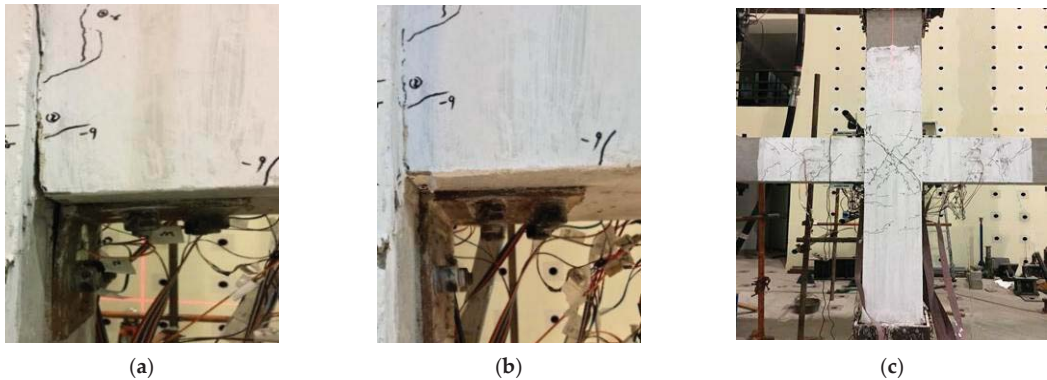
Crack pattern and failure mode of the HPC connection: (a) opening of crack; (b) closure of crack; (c) failure mode.
